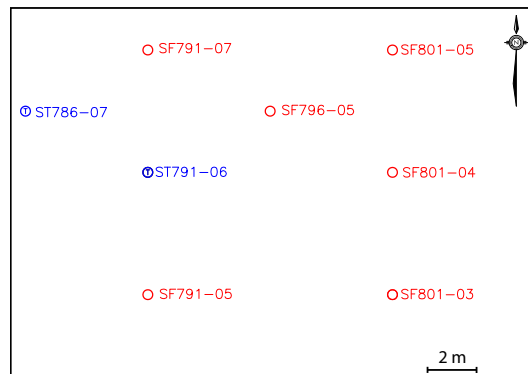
Layout of the eight boreholes in the Surface Freezing Test - plan view at the surface (in red : freeze holes ; in blue : measurement holes)
